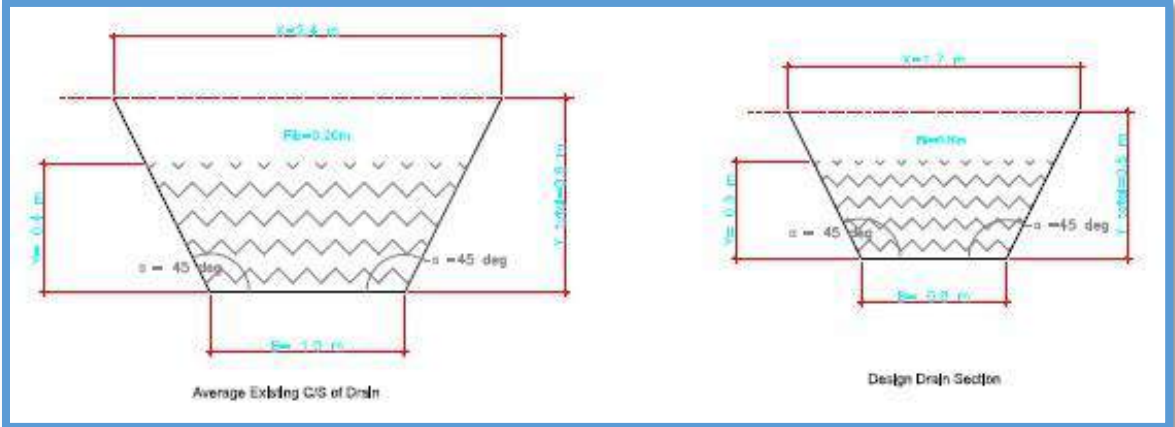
Typical Drain Cross Section for Perseverance Roadside Earthen Drains
